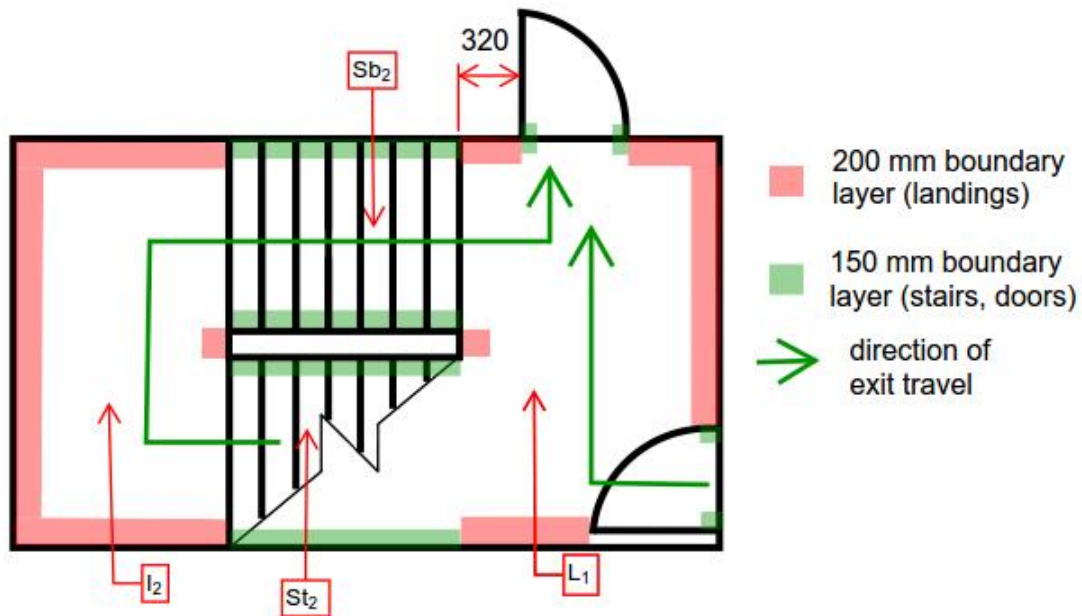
Plan of exit stair at level 1, with dimensions shown in mm
